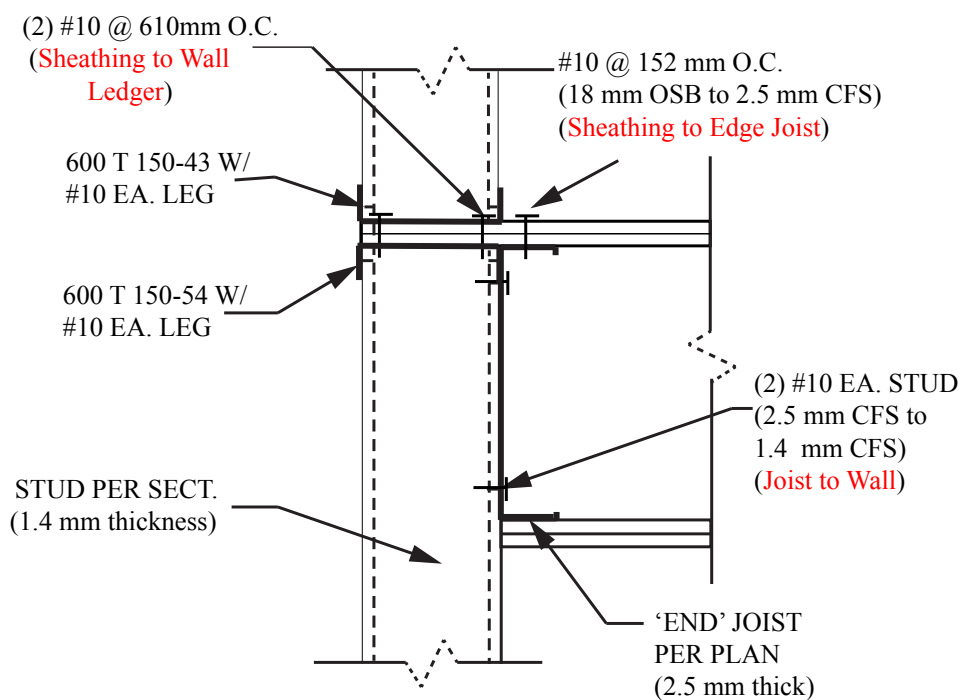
Ledger framing detail where the floor frames into the short-direction shear walls (section Ledger Detail in Figure 6.1) - note how the sheathing is sandwiched within the wall ledger providing a direct load path from the walls for ground motions
